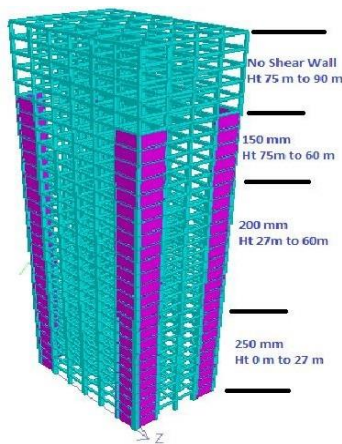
3D view of frame with position of stepped shear wall with curtailment at top stories
